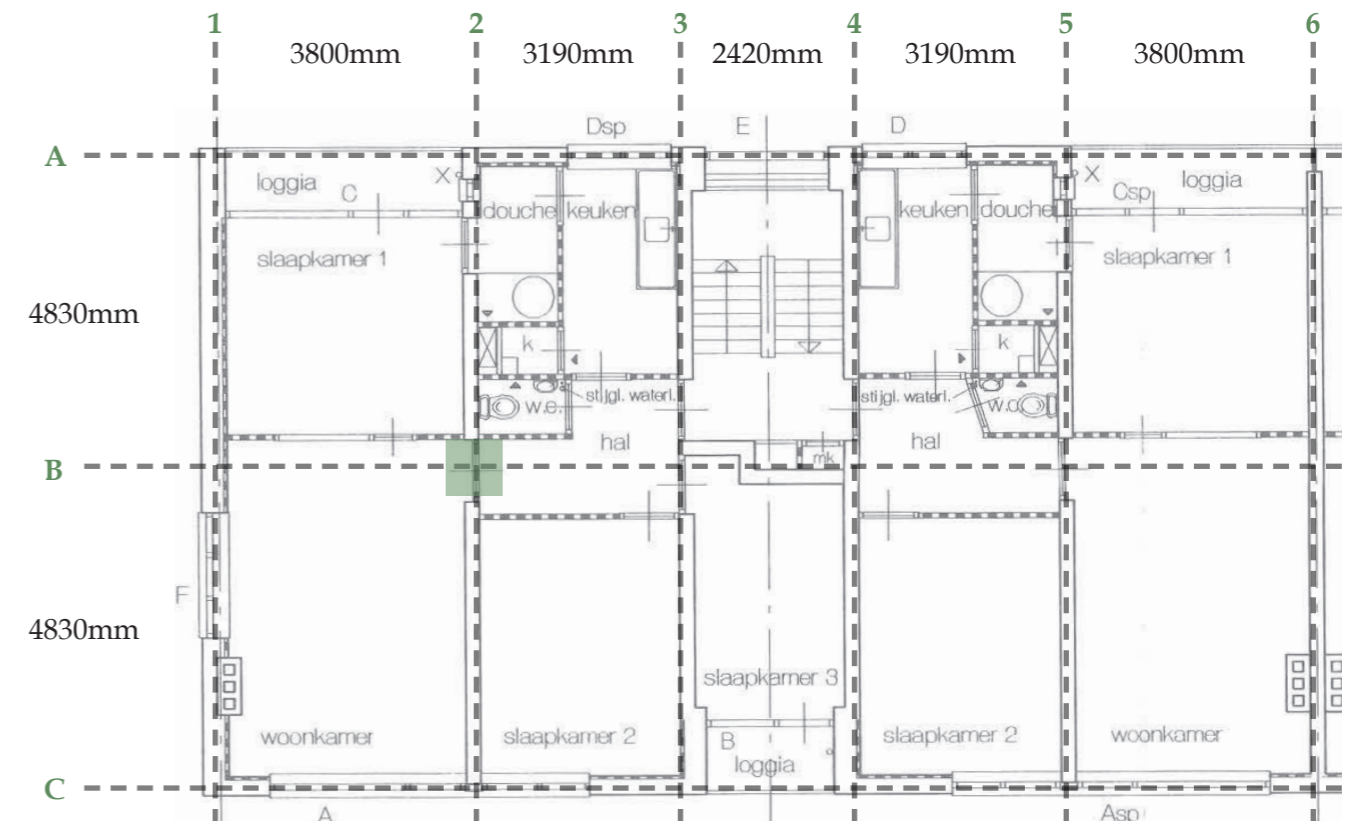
Pirandellostraat segment of building floor plan with added gridlines (TU Delft, n.d.)
